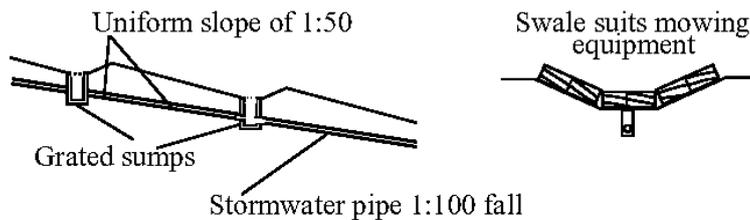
Longitudinal section through a mowable drain, and a cross section showing how the swale should suit the mowing equipment.
